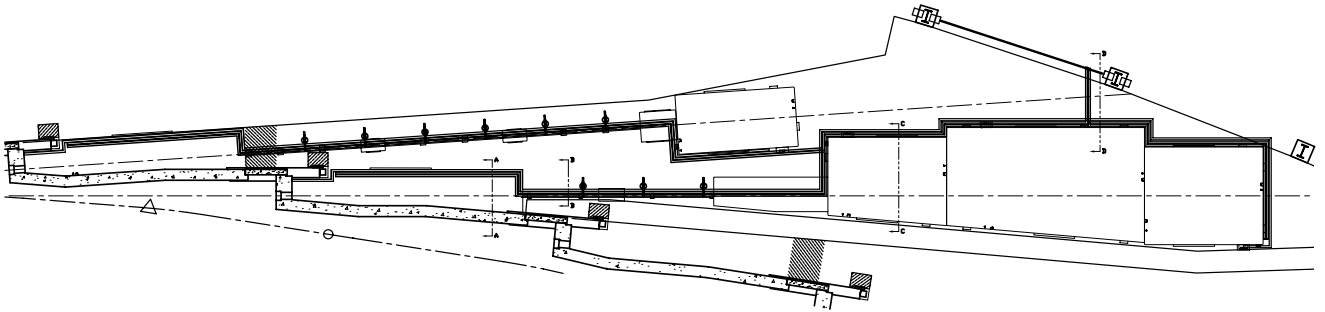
Utility layout for Sector 12. Top view of the cable tray layout for both the Bending Magnet and Insertion Device beamlines is shown.
